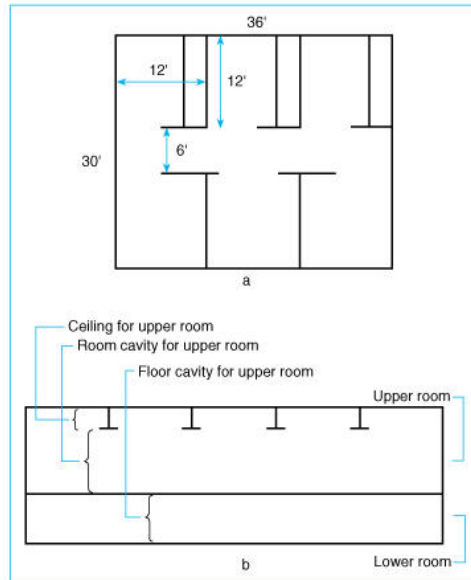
Open plan office for example 1: (a) layout, (b) section.
